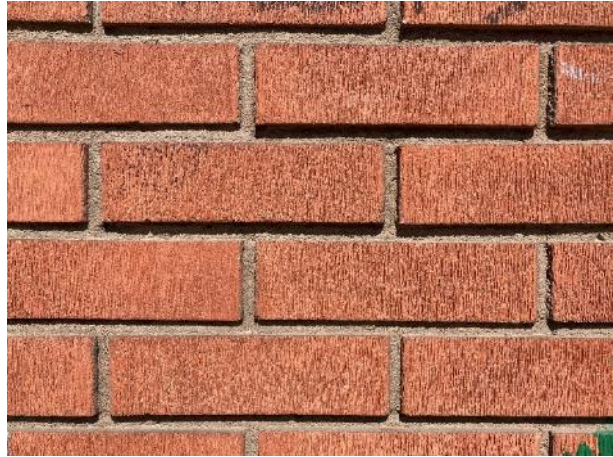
Brick veneer on ground level of east elevation of 325 James Street North
